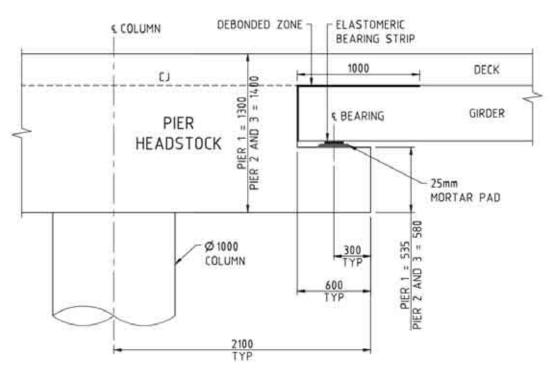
Elevation of span over the UP main, showing semi-integral arrangement and cast in-place pier headstock and column
